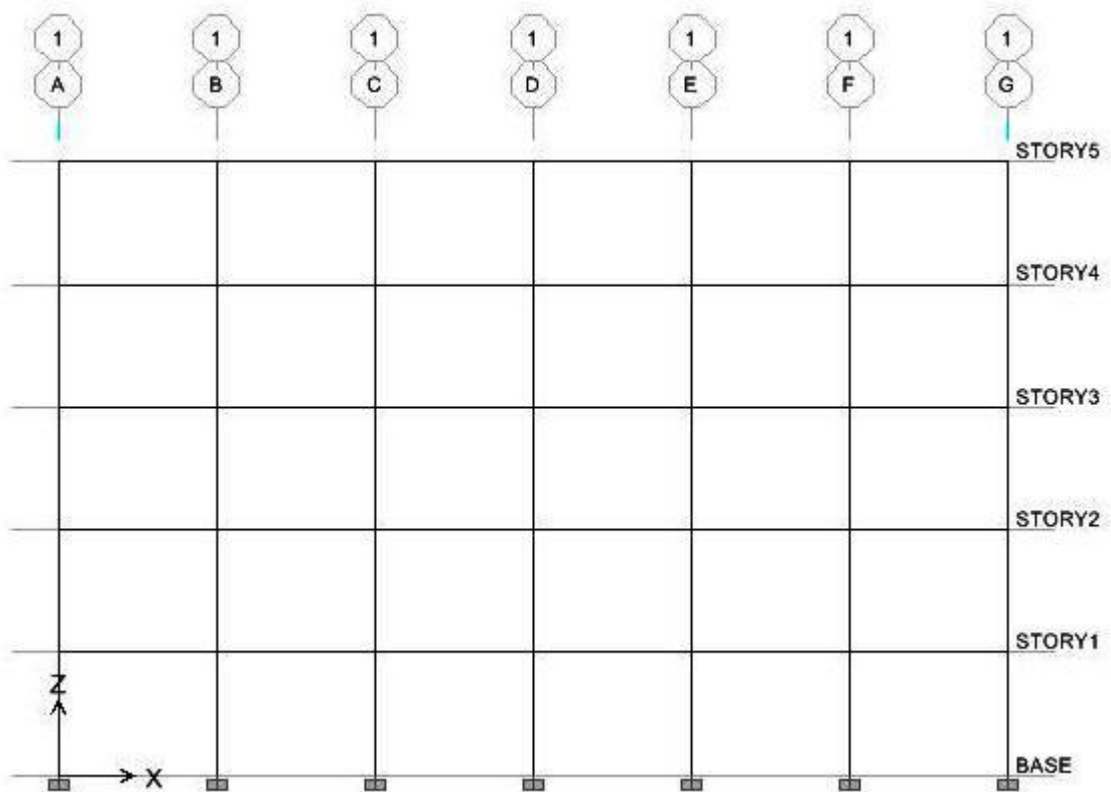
ELEVATION VIEW FOR 5 STOREY R/C FRAME BUILDING
